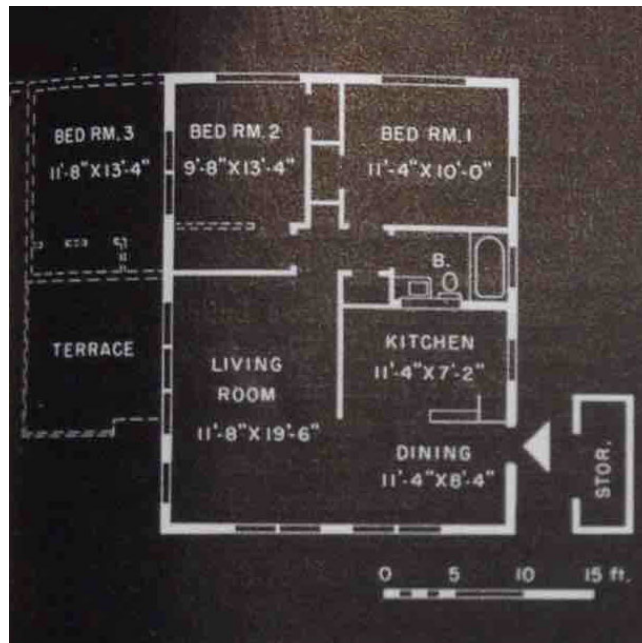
Plan of Brockbank Trade Secrets House, 1952. Source: *House & Home*, September 1952, page 129.
